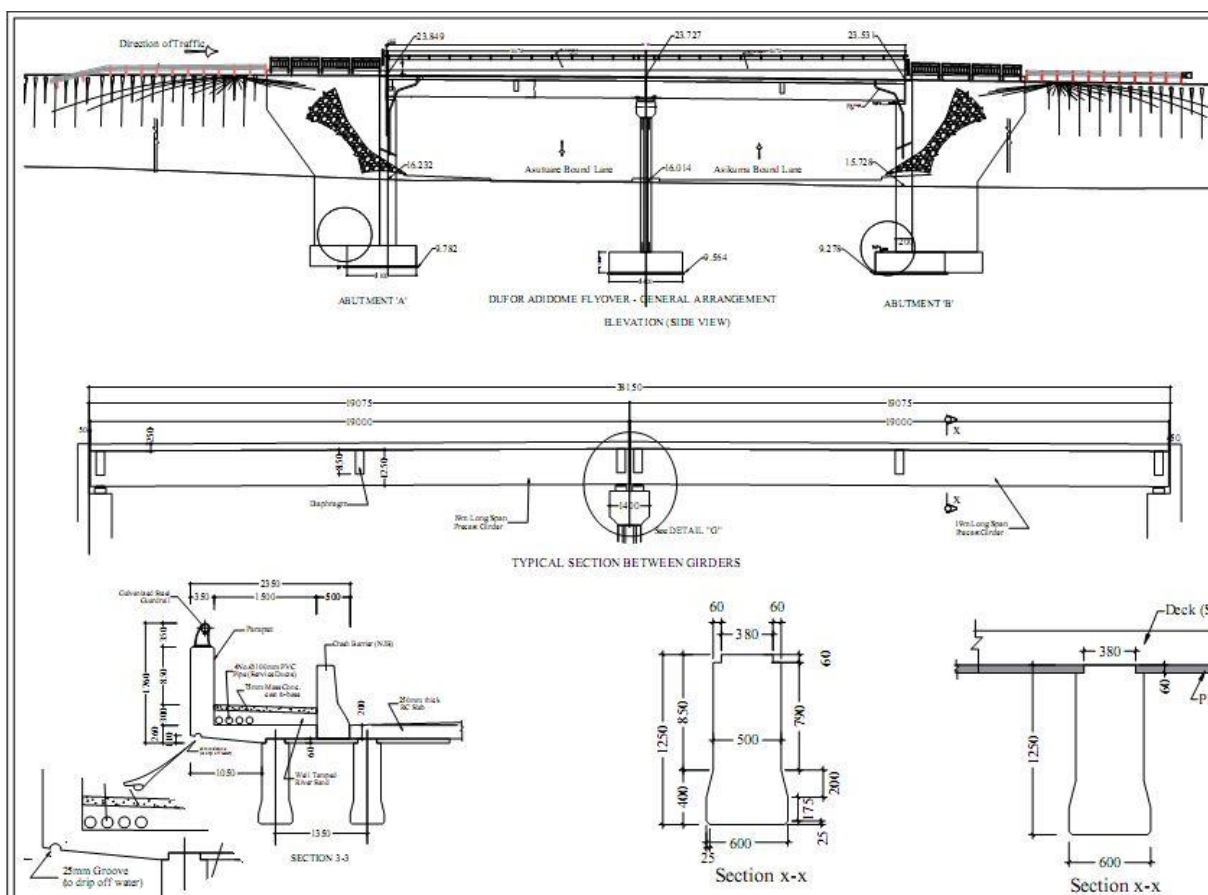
Bridge on Dufor Adidome Interchange CH. 29+350 on Section 3 Project Road
